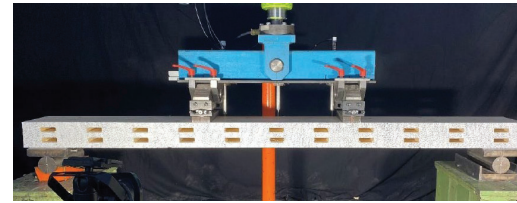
Test setup for large-scale bending tests of a configuration (B) specimen and location of measurement points.
